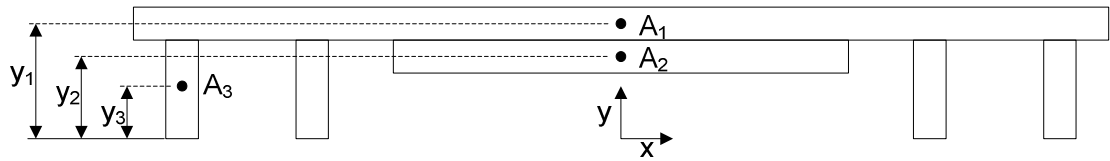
Cross section of bearing platform indicating the dimensions used in calculations
